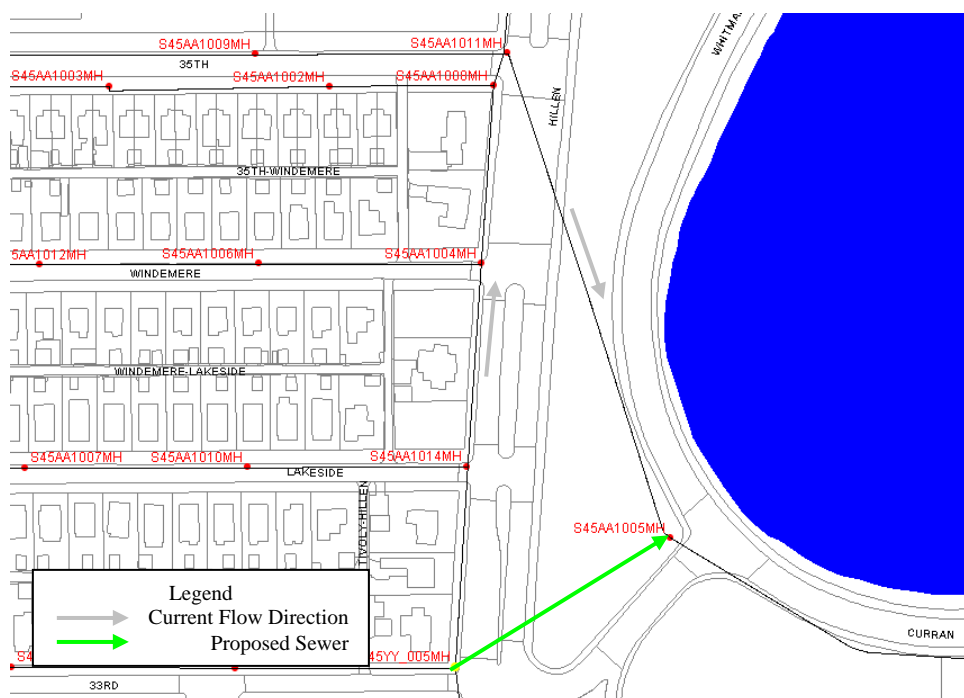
Proposed Tiffany Run Hydraulic Improvement
